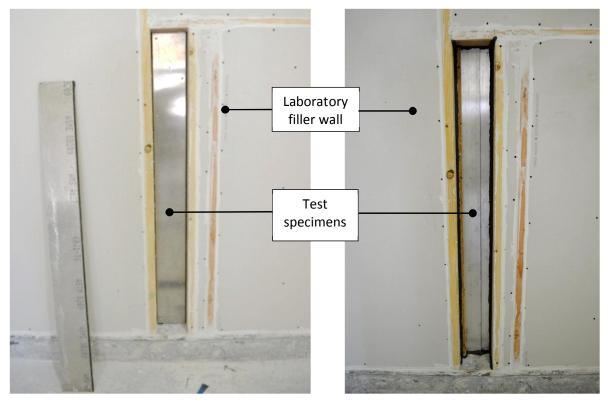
ELEVATION VIEW OF PHASE 2B TEST SPECIMENS IN FILLER WALL (LEFT – PARALLEL, RIGHT – STAGGERED)
